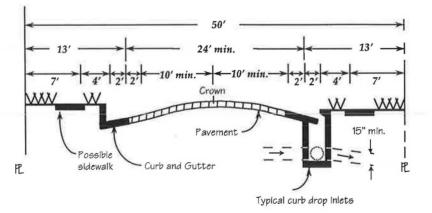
Cross section of typical urban local street, curb-and-gutter section (not to scale).
